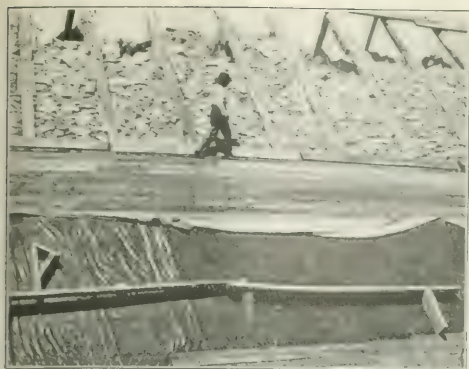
PLANKING AND SAIL CLOTH BEING PLACED ON FACE OF DAM
